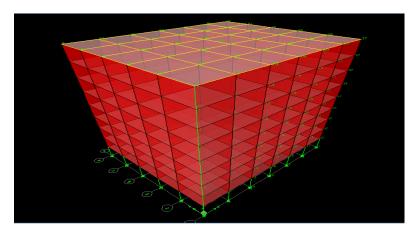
Elevation of nine storeyed Building Model 4 (ground soft)
